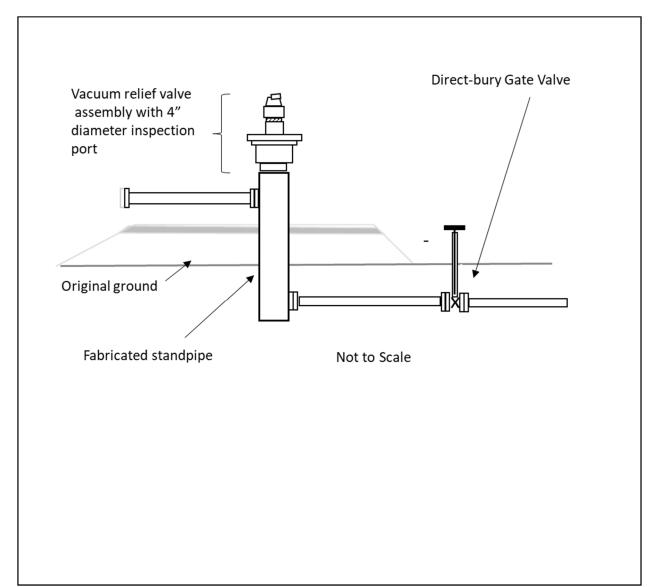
Additional facilities at Wells W3 and W6 for draining and freeze protection.
